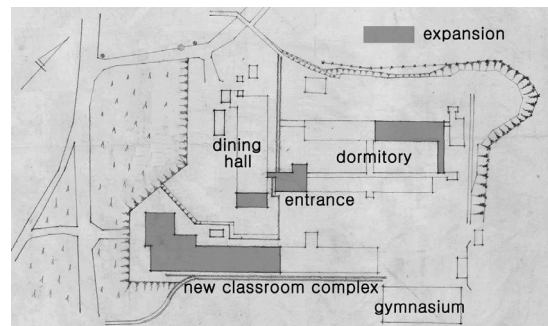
Site plan showing new classroom complex and dormitory [27]
